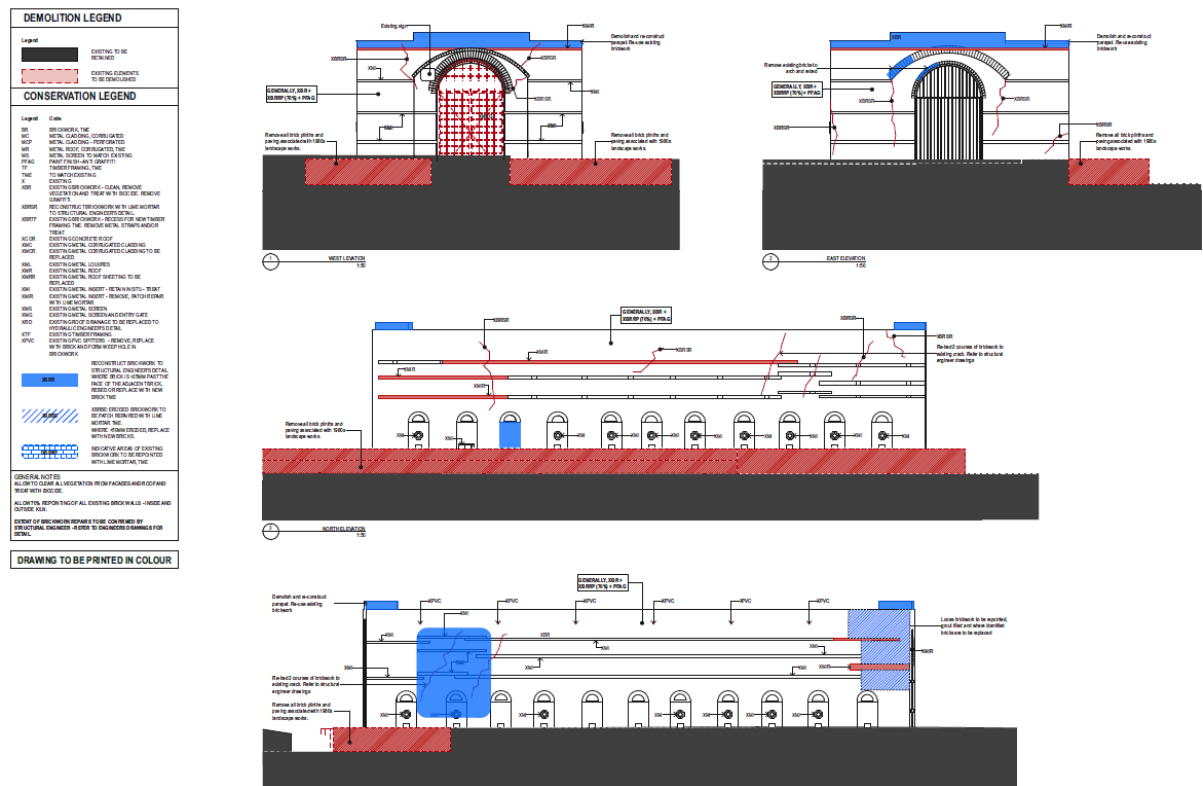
Proposed Down Draught Kiln 3 Conservation Elevations
